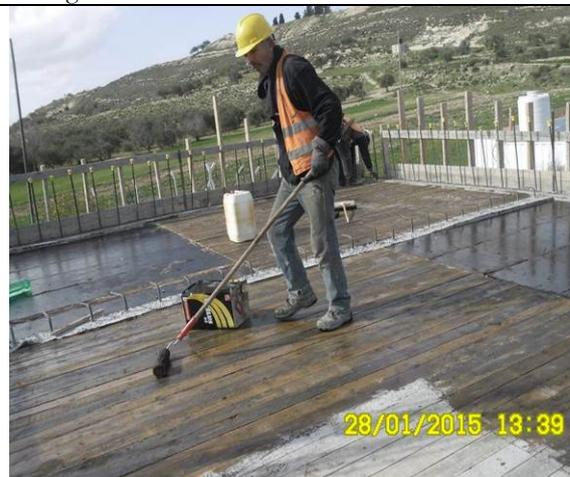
h of January, 2015: Continue formwork and start steel reinforcement for the Electrical Metering building elevated slab.
